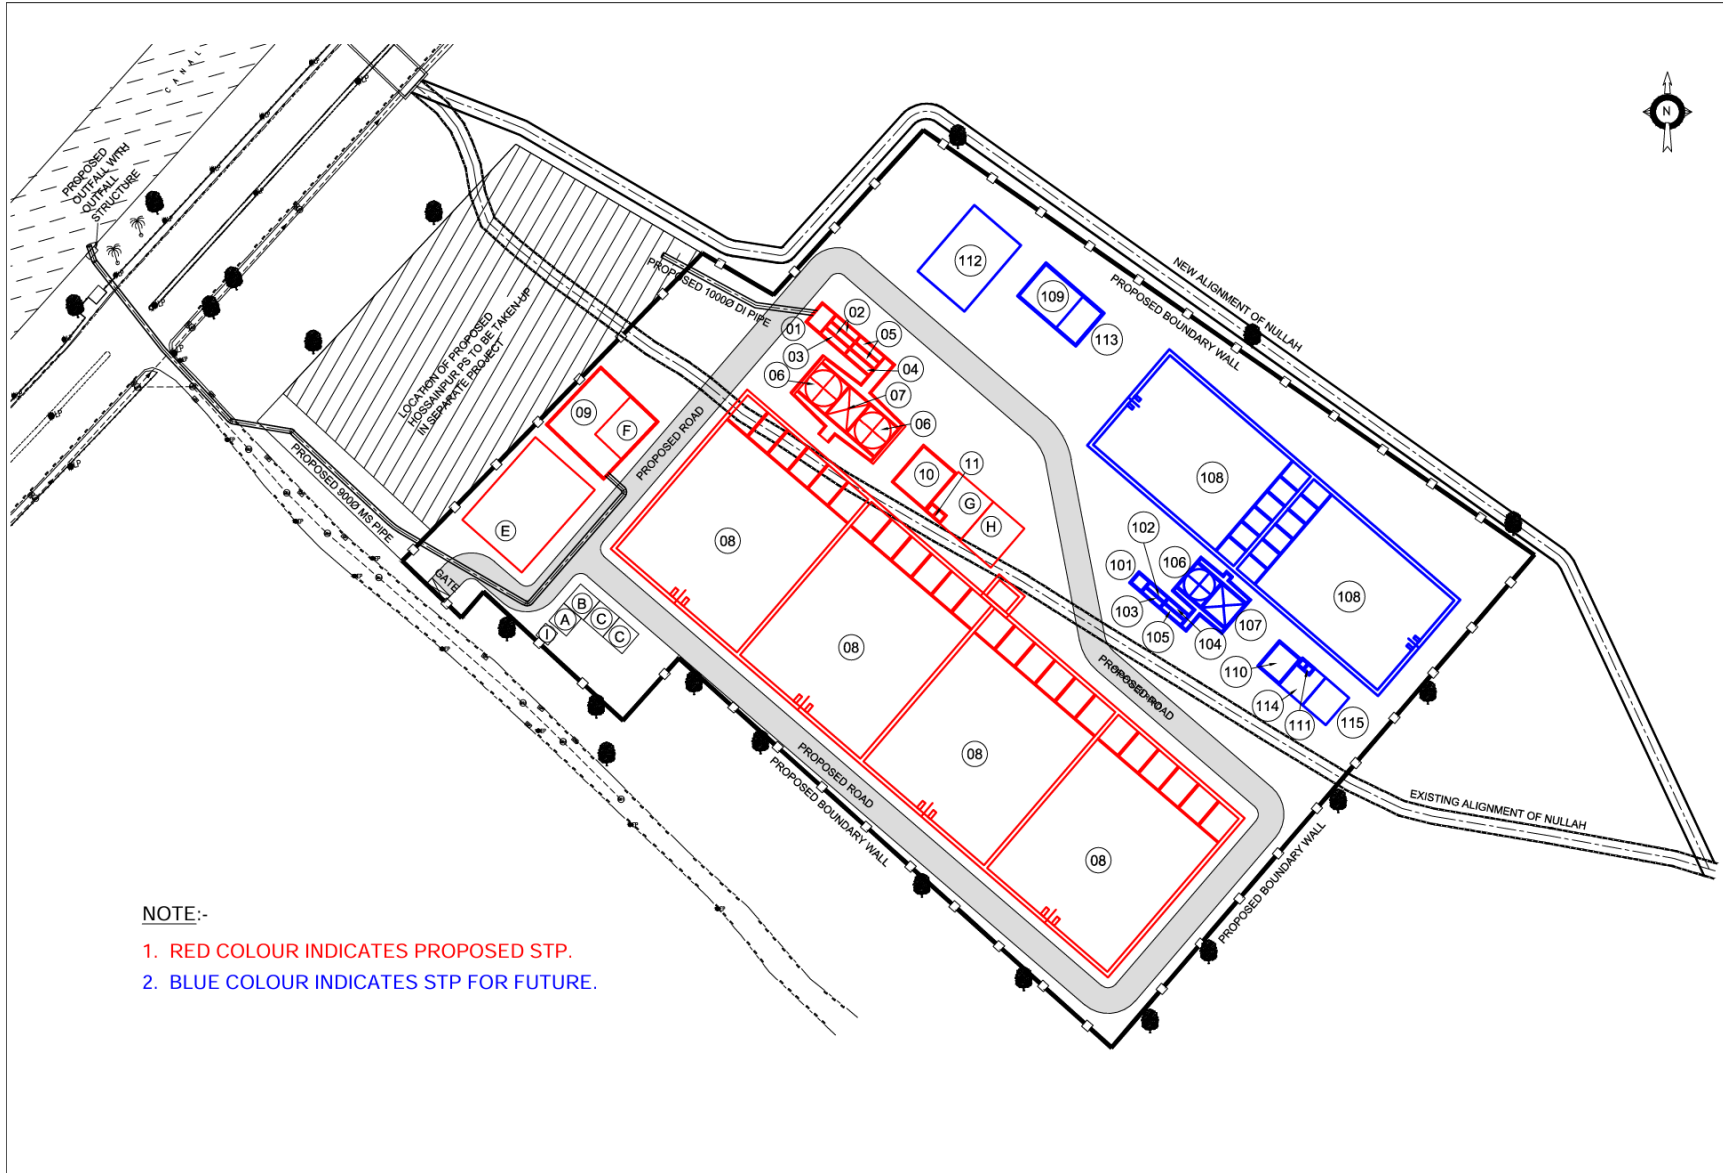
Layout Plan of Proposed STP Location and Drain Diversion Plan
